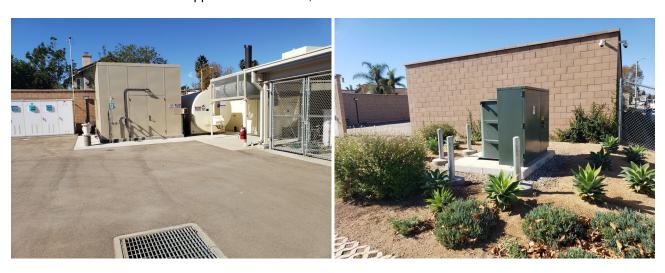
Existing Lynwood Well Site at Woodcreek Park
